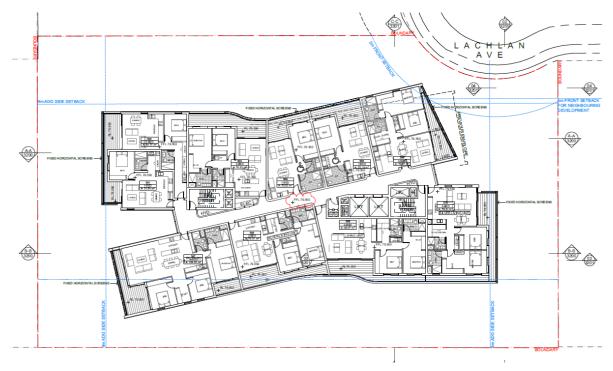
Level 5 floor plan. This is also the typical floor plan between Levels 4 and 12.
